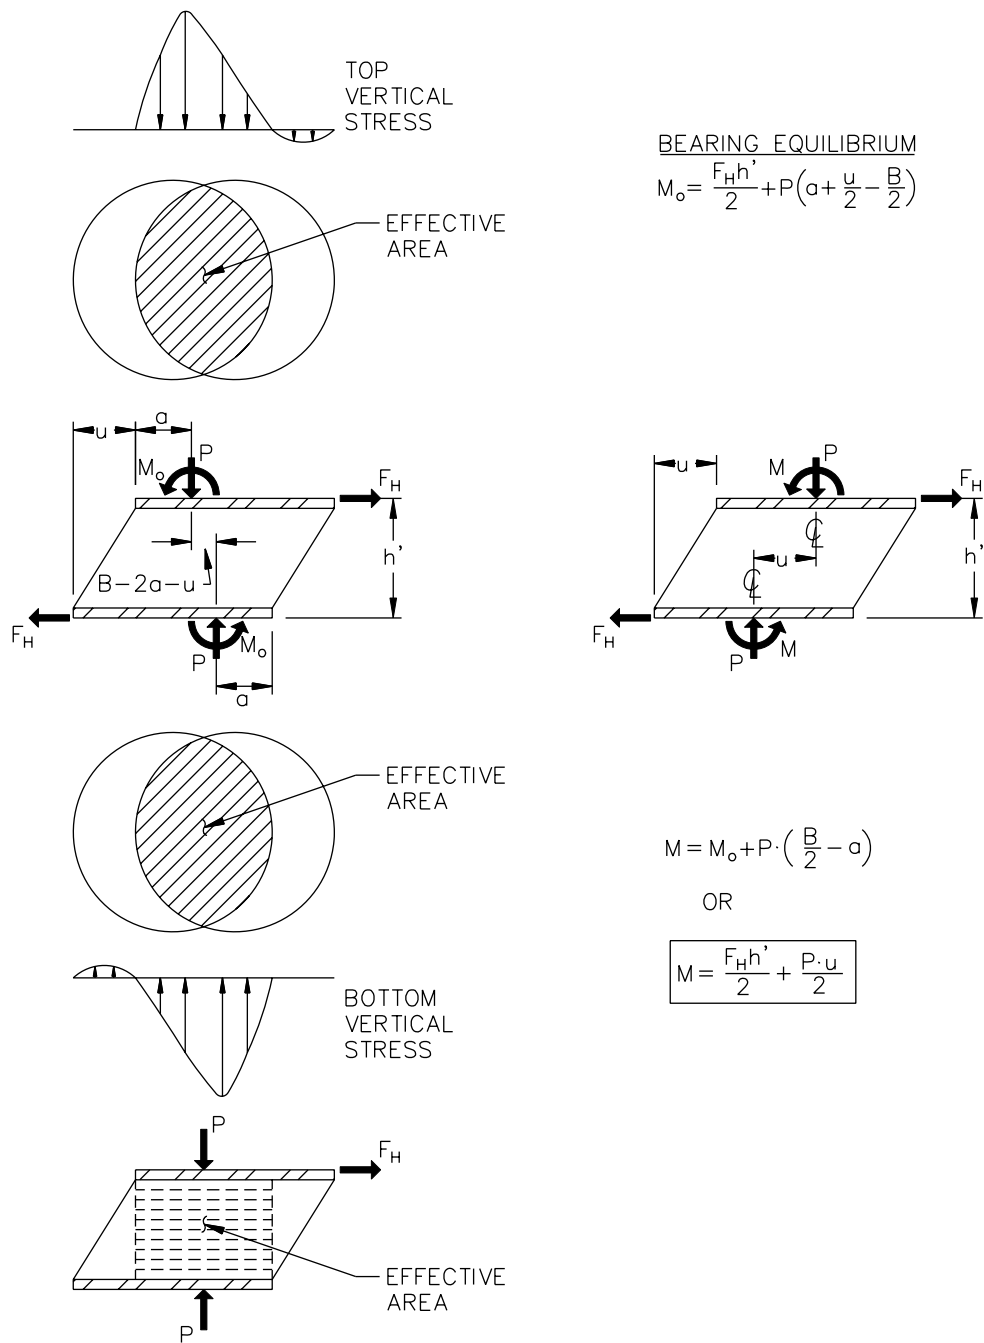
Deformed Bearing and Forces Acting on End Plates
